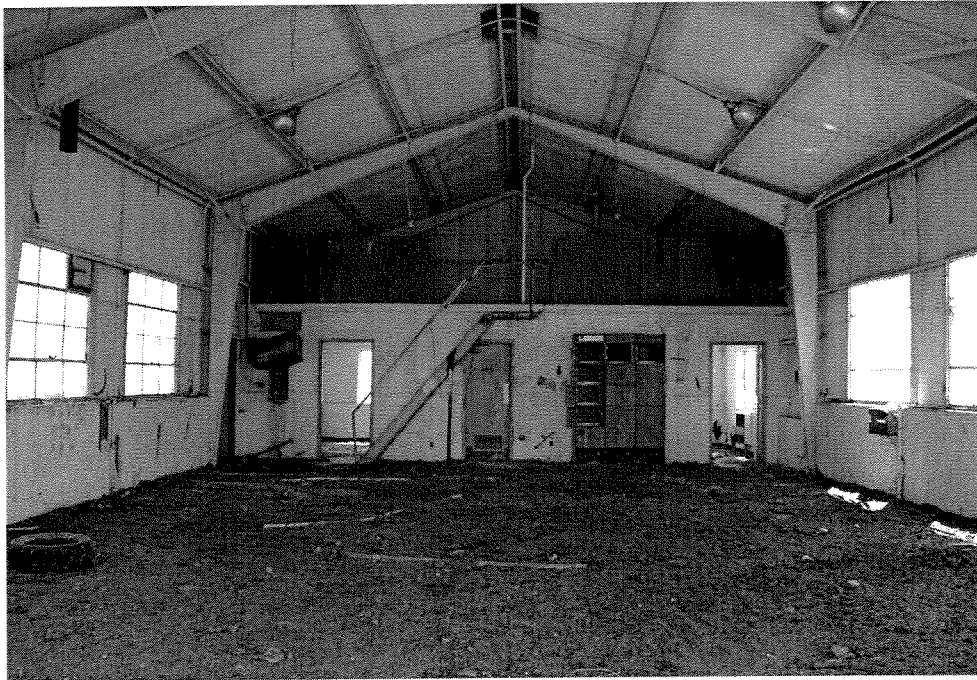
Facilities Shop (Unit 145), Beta Test Complex, 1963-1964. Looking southwest. View of May 2005.
